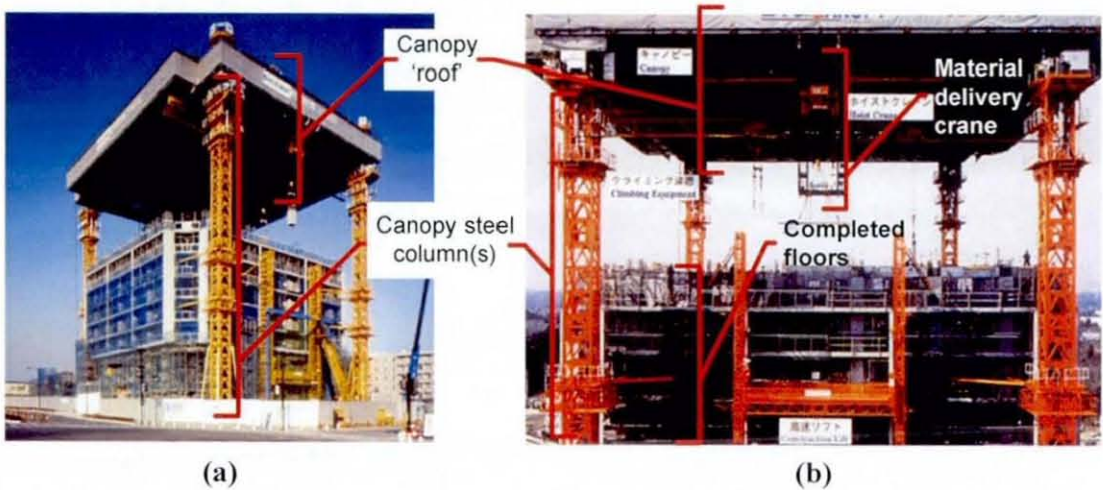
Obayashi Corp.'s Big Canopy system: (a) Assembling of precast concrete (PC) building; (b) factory floor (Obayashi, 2004).
